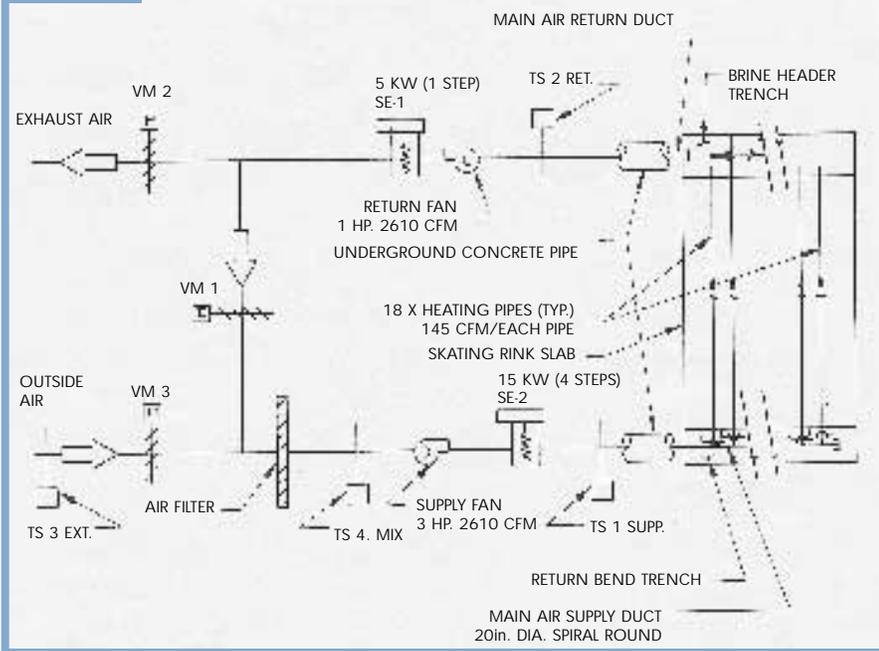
SUBFLOOR HEATING/VENTILATING SYSTEM
